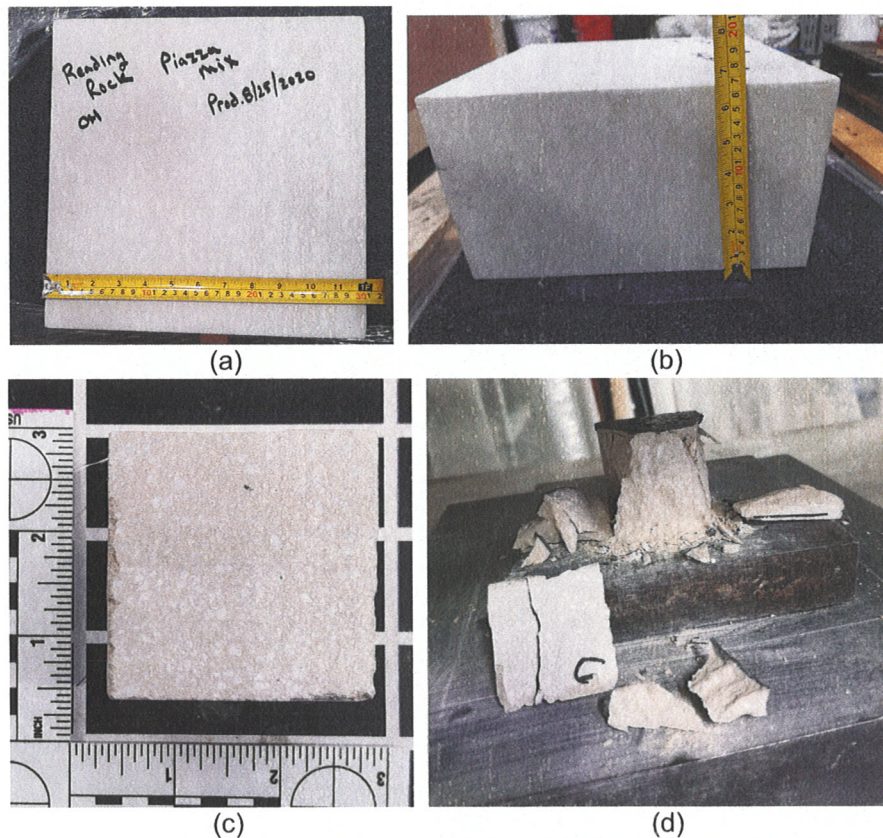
(a) Cast block specimen plan view; (b) Cast block specimen elevation view; (c) Cube specimen prior testing; and (d) representative cone type failure mode of cube specimen
